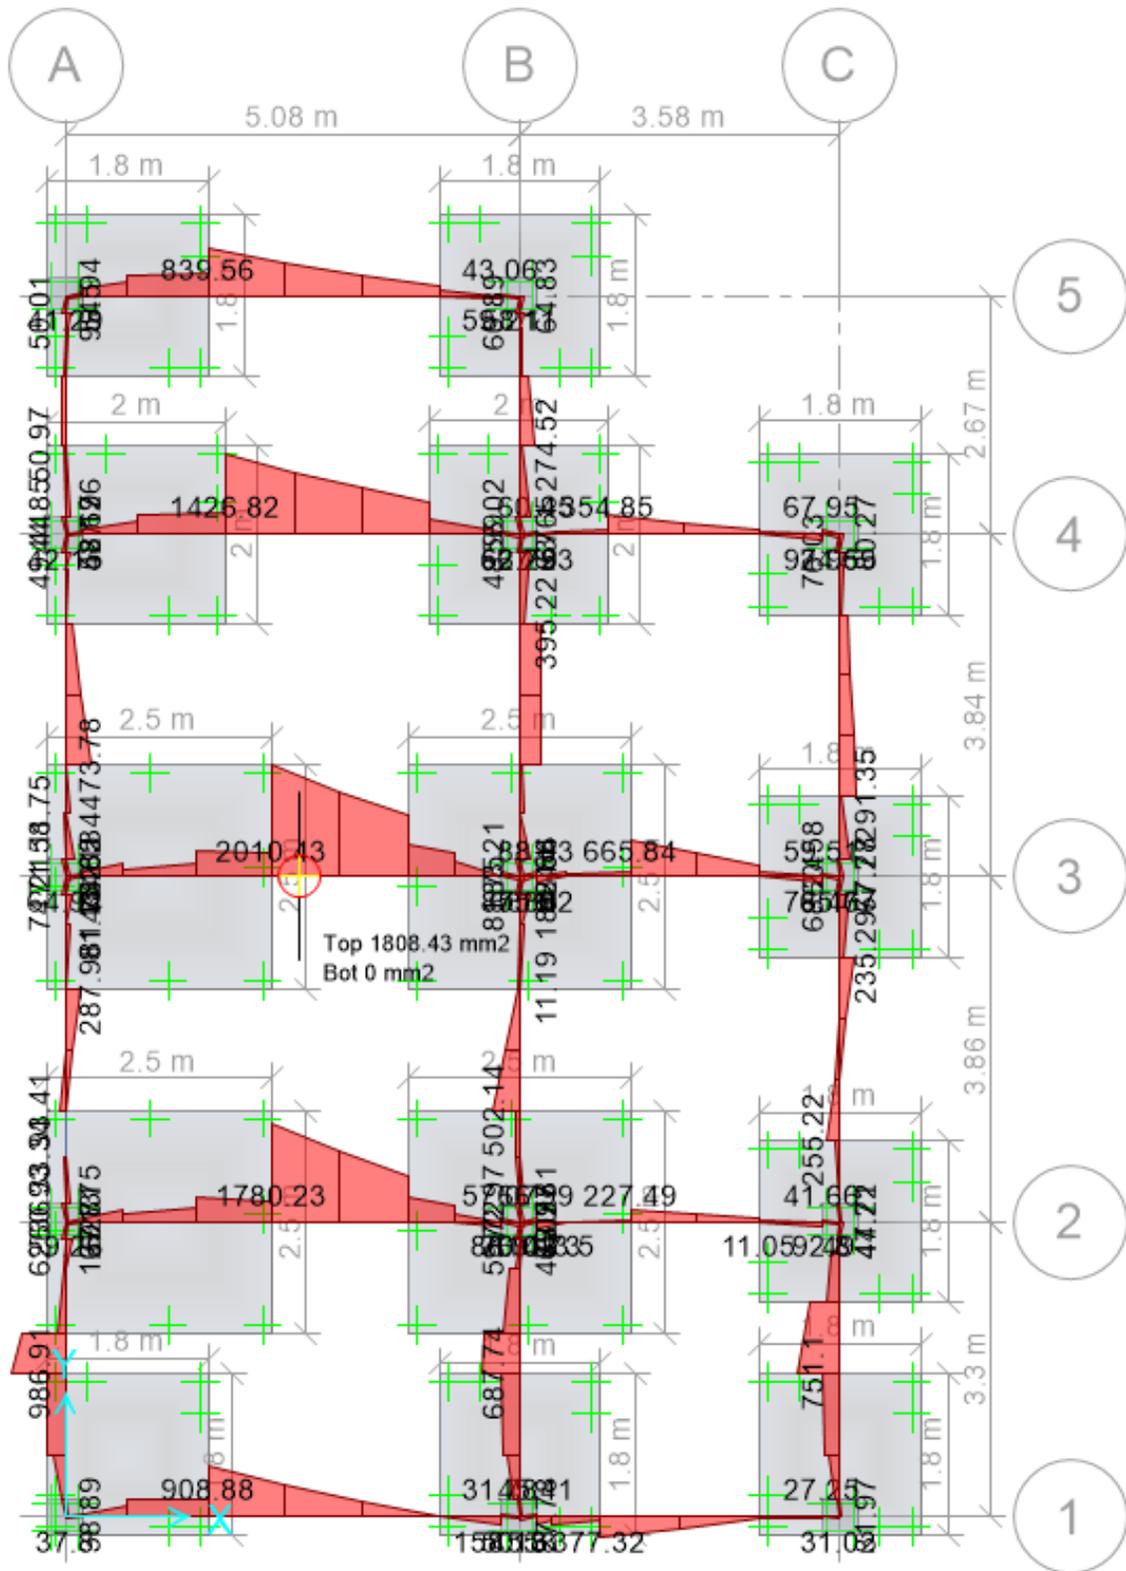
Footing Beam Longitudinal Reinforcement Detail
